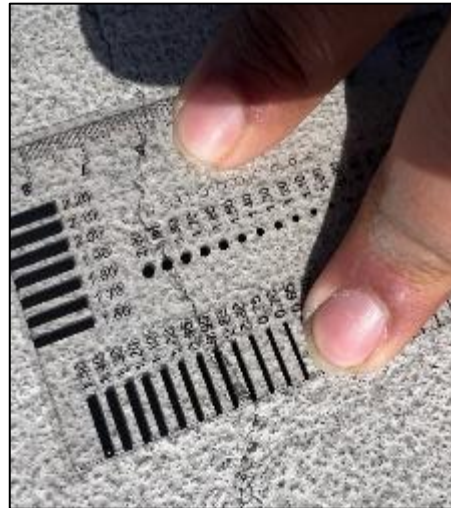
Crack width gauge being used to measure the width of a crack accurately
